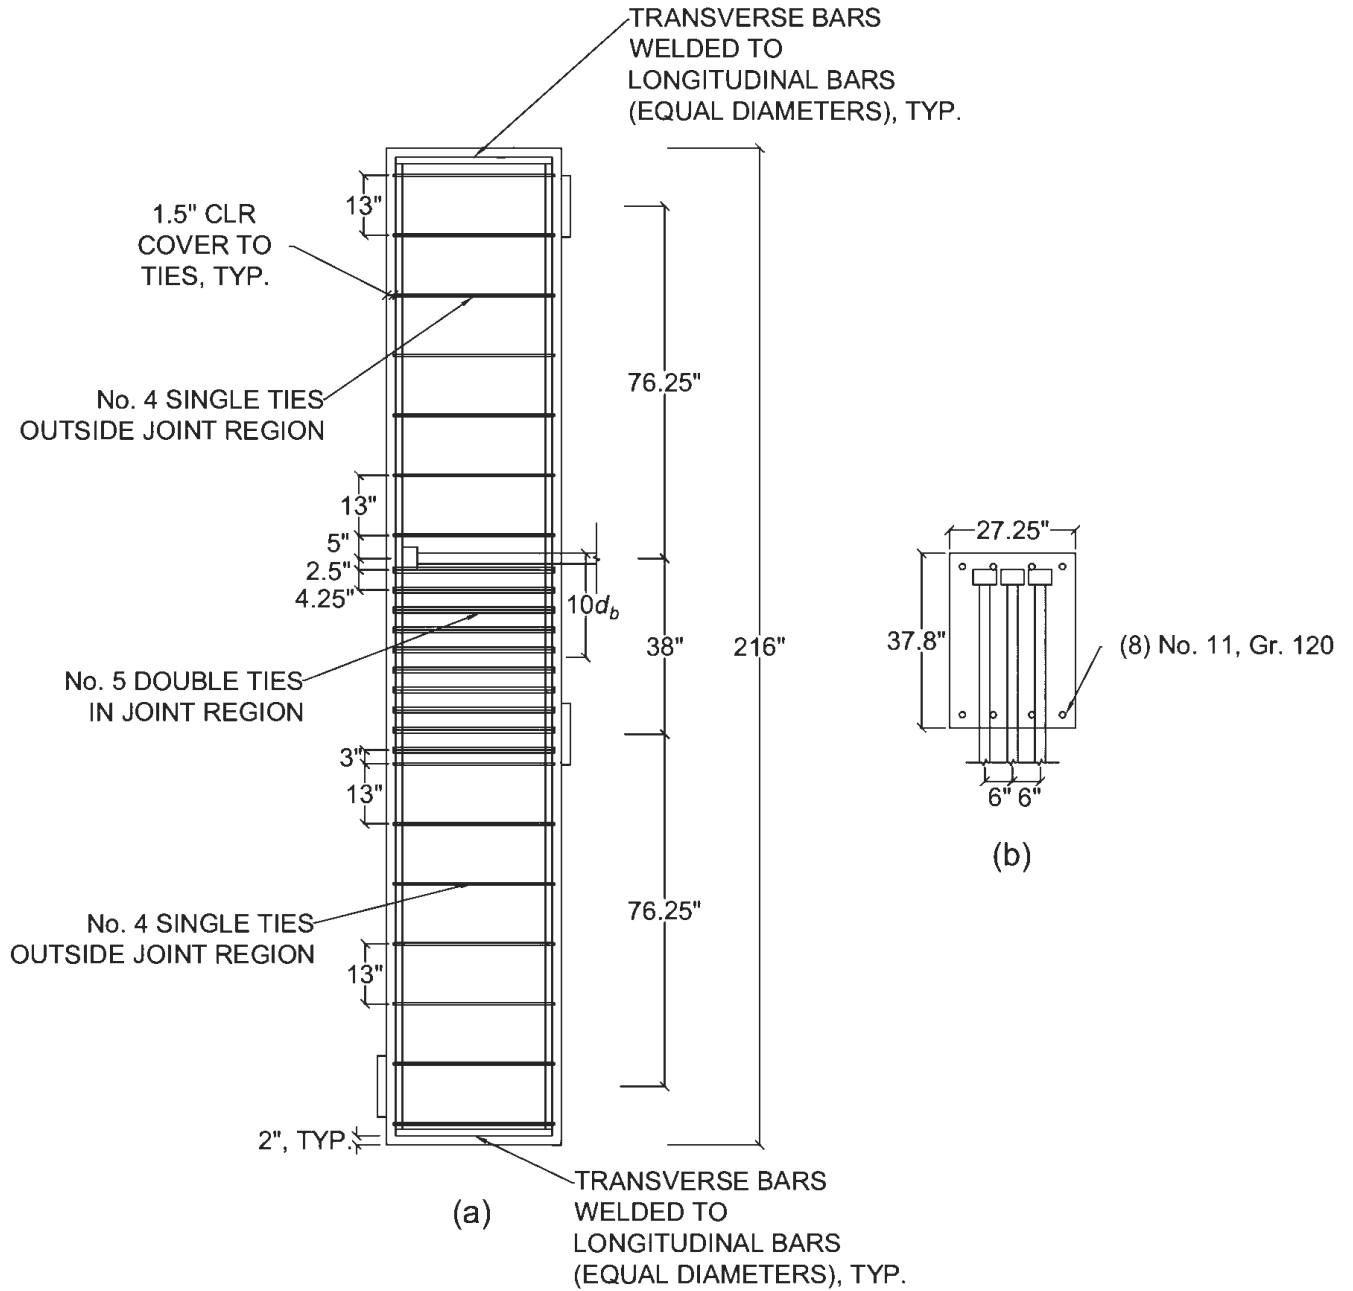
Details of reinforcement layout for No. 18 headed bar specimen 18-8: (a) elevation, (b) cross-section
